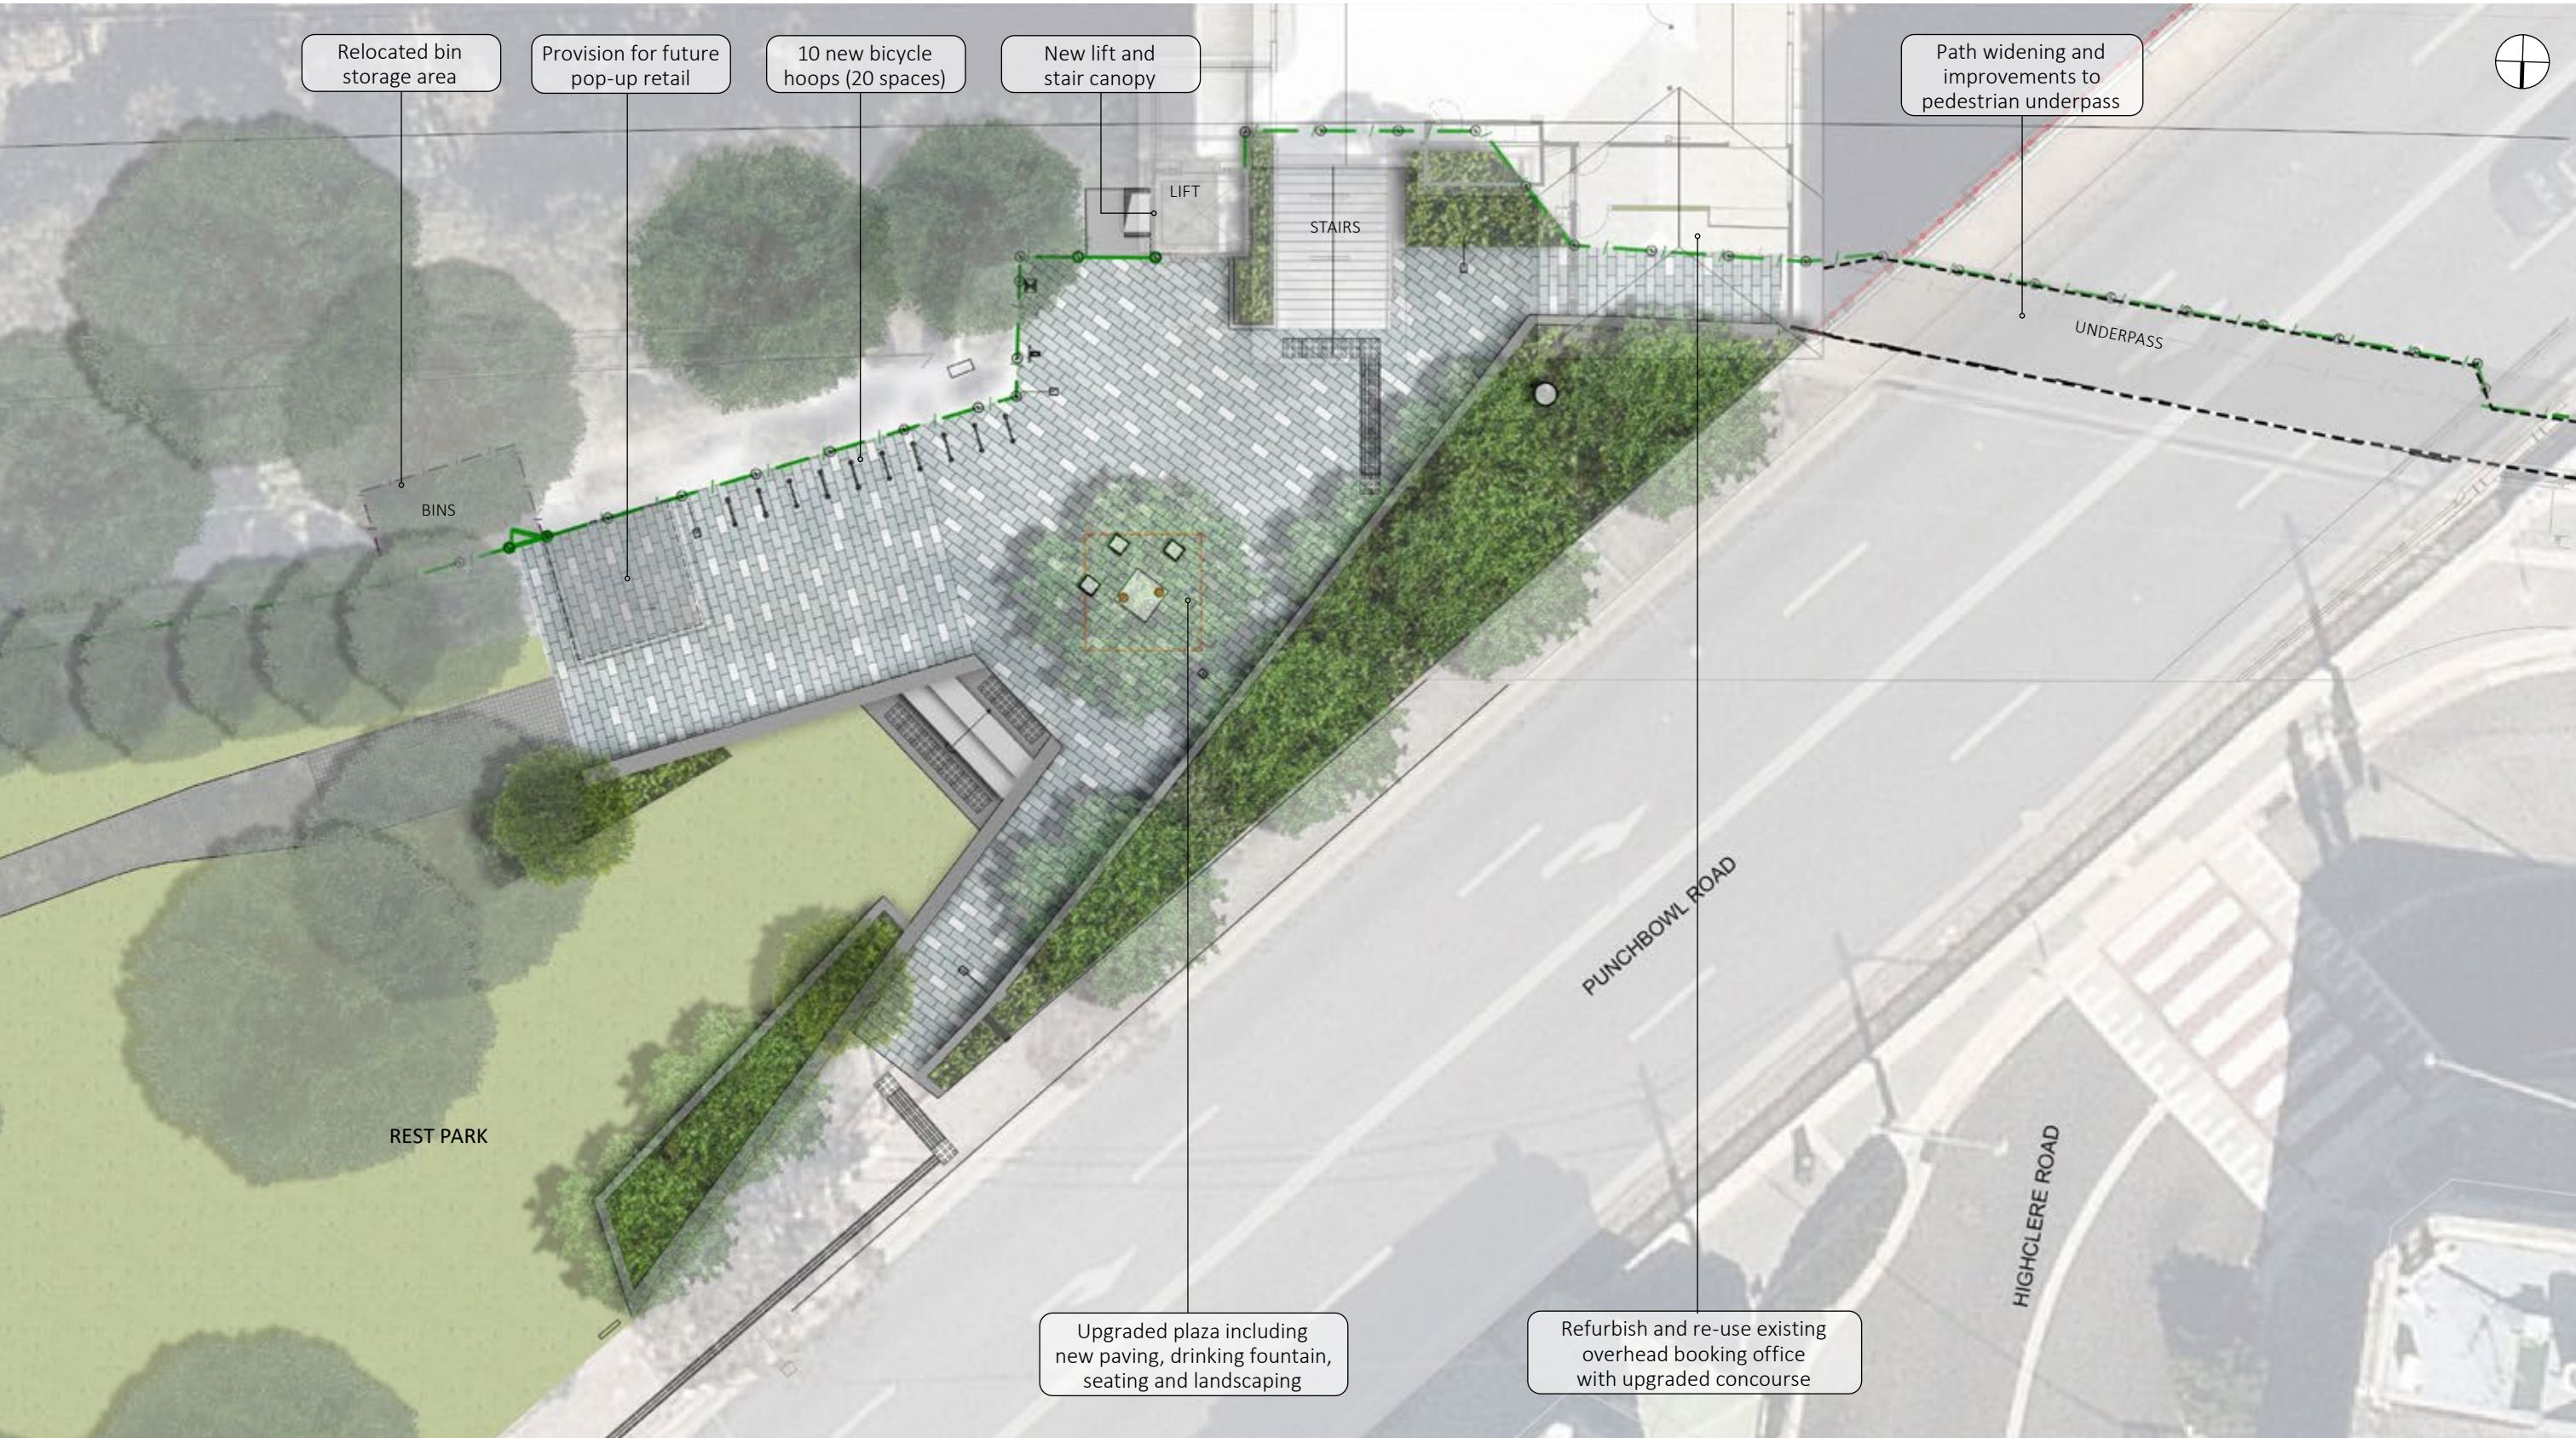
Station precinct plan: Northern plaza detailed plan
